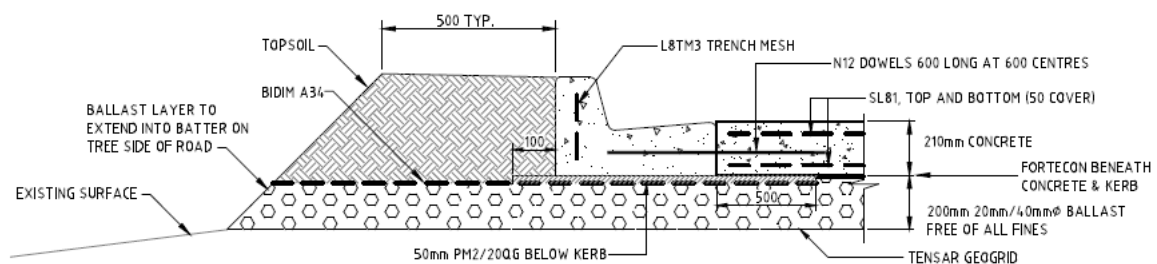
Bremer Street driveway link design cross section (image: Greenhill)
